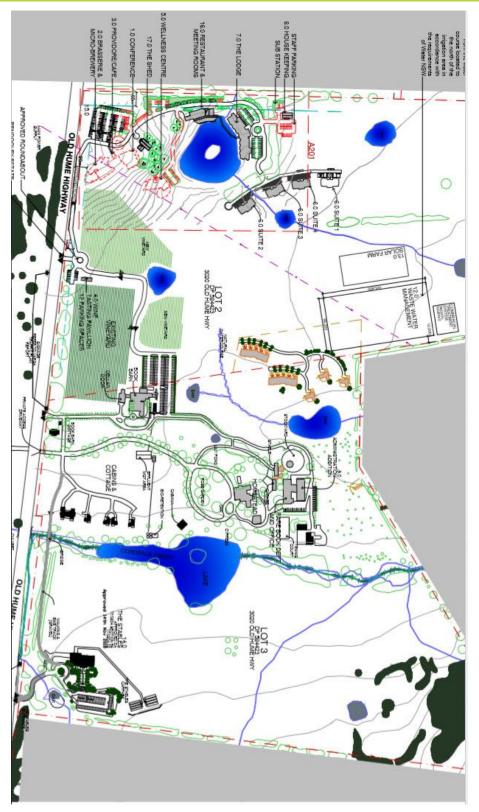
Proposed Concept Plan extract Proposed modifications indicated in red
